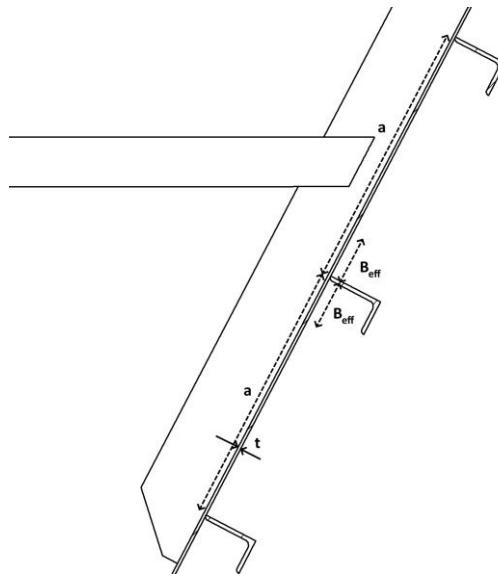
Determination of effective width of wall plate stiffened by L-profiles.
